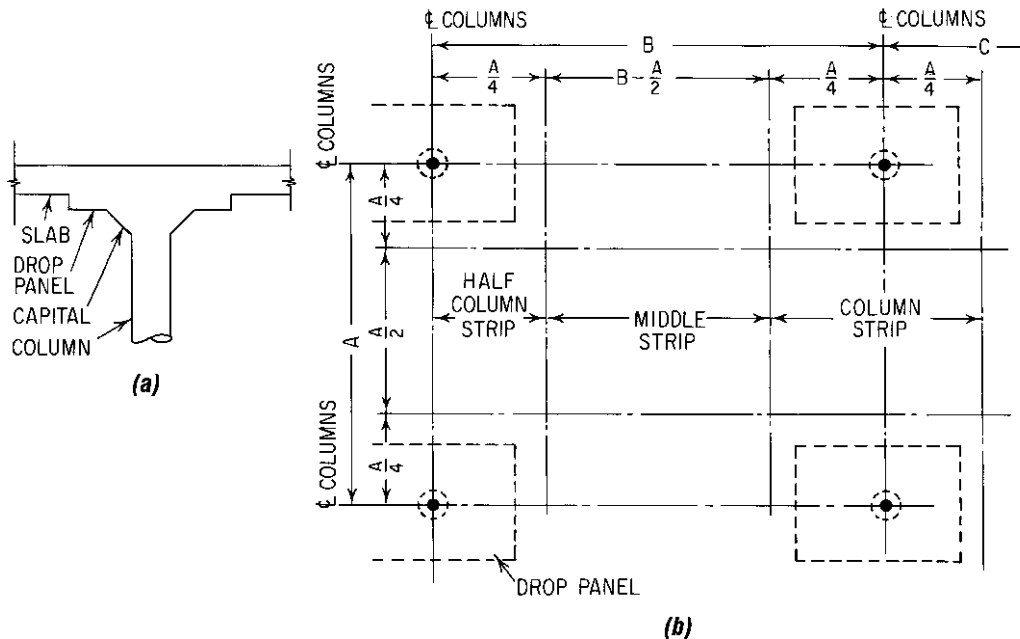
Concrete flat slab: (a) Vertical section through drop panel and column at a support. (b) Plan view indicates division of slab into column and middle strips.
